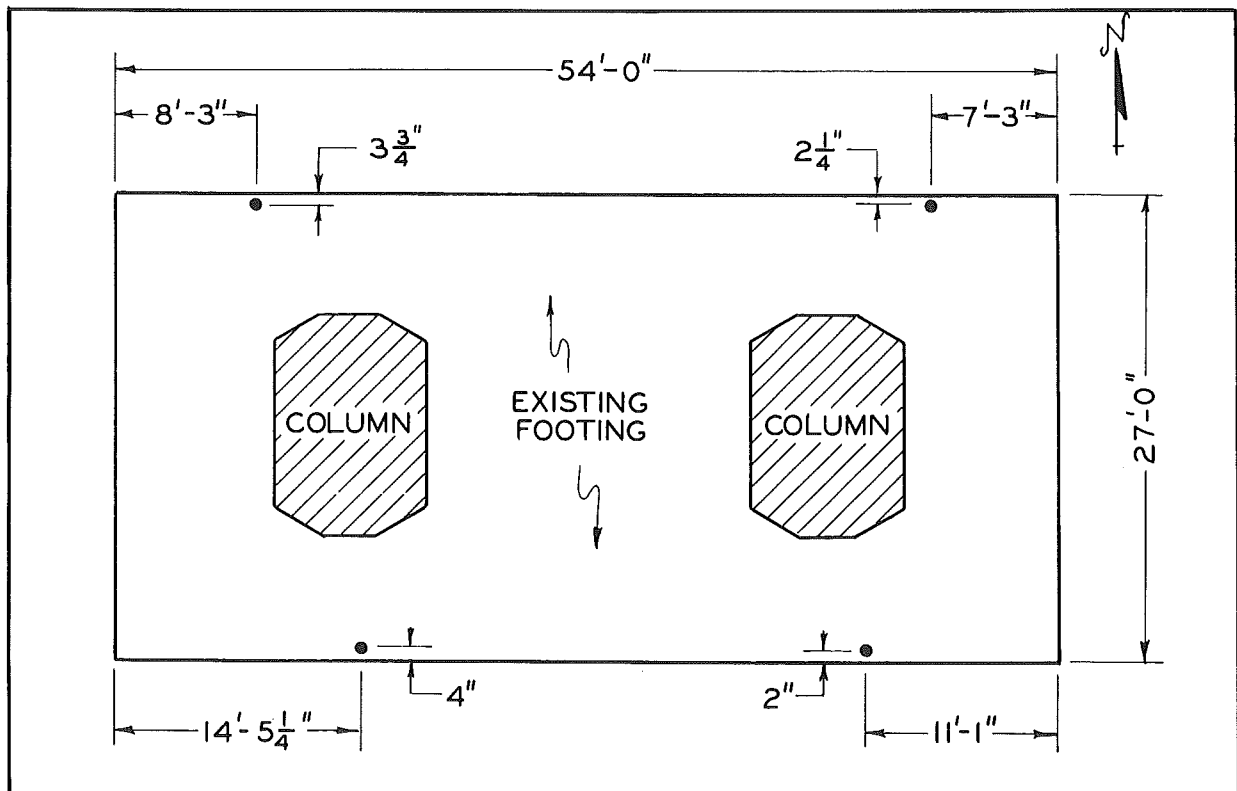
Location of points for monitoring elevation of damaged footing.
